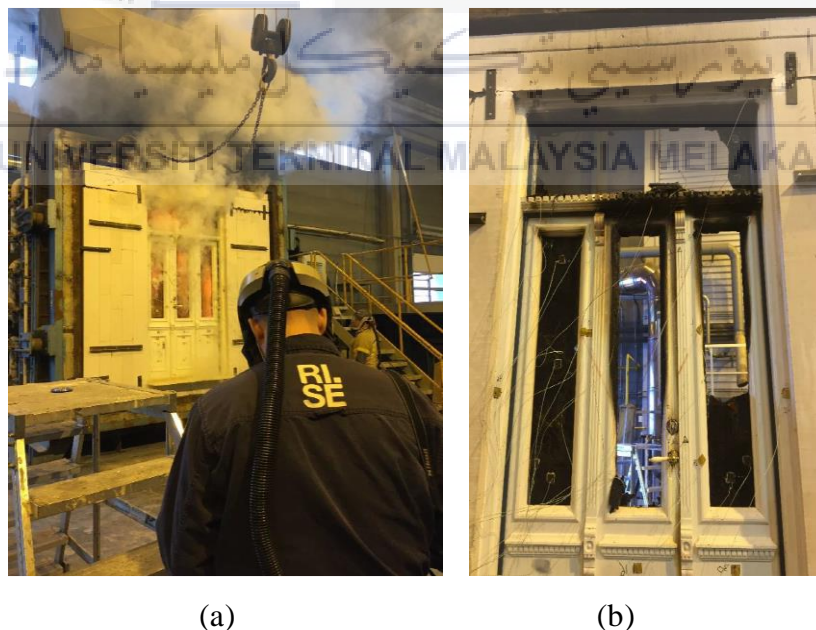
(a) Fire resistance test in the furnace and (b) after test ended (all glass panels are damage) (Storesund, 2020)
